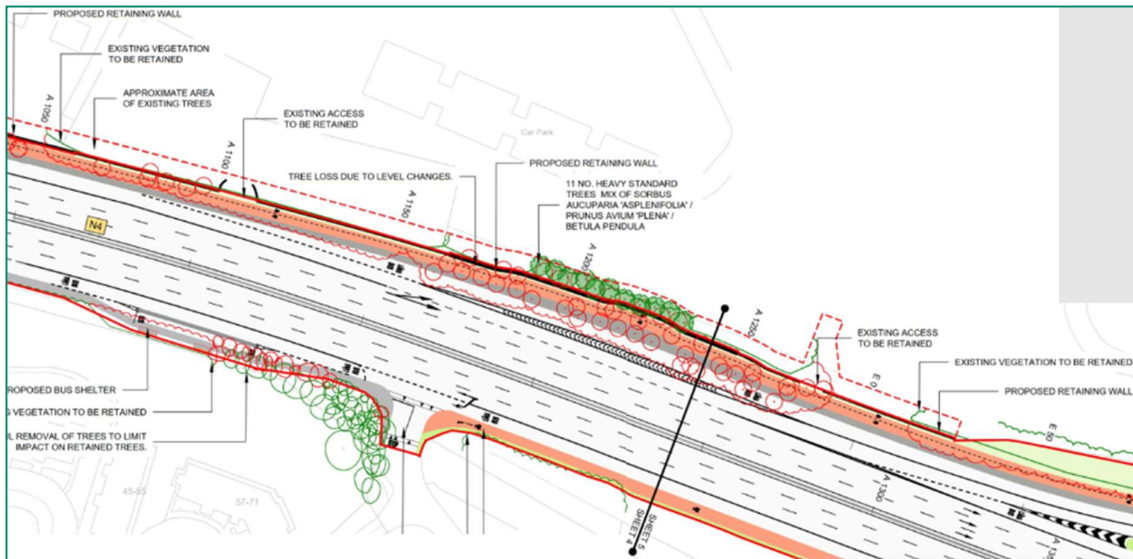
Extract from Landscape General Arrangement drawings at Hermitage Clinic
